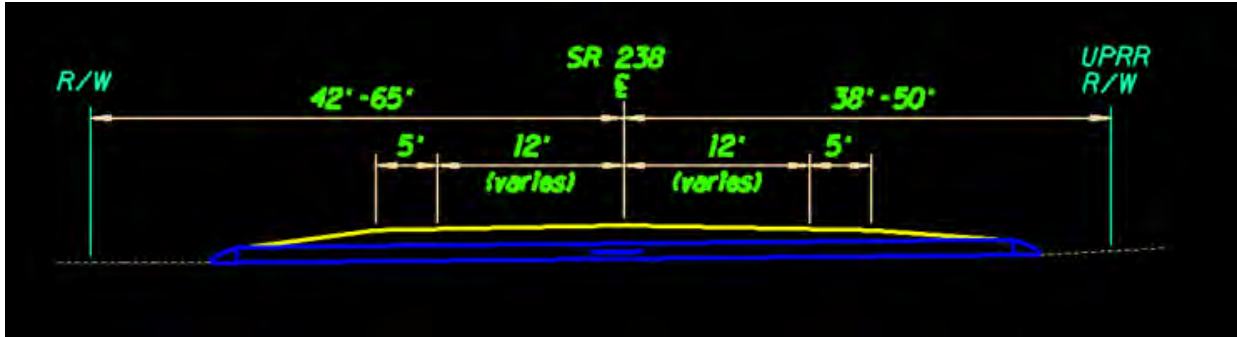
Proposed Typical Cross Section for the new Culvert Locations
